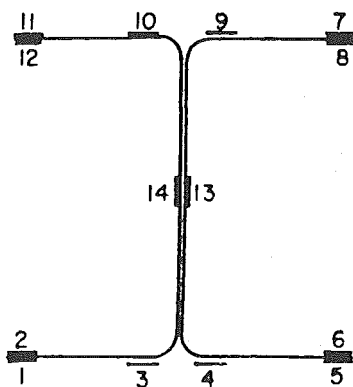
Locations of Strain Gages at Midheight of I-Shaped Stub Columns
